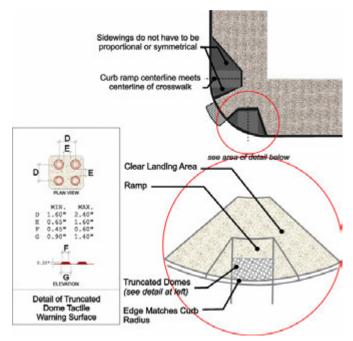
Detail of an ADA-complaint curb ramp design with truncated dome measurements.
